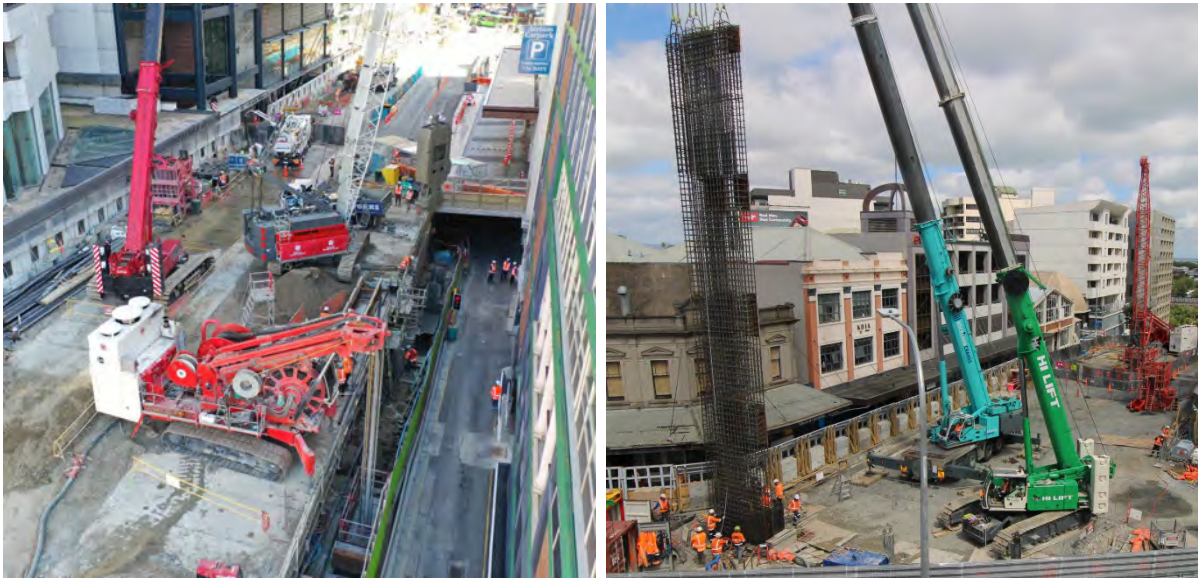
Diaphragm wall digging (using hydrofraise in front & grab behind) and cage lifting
